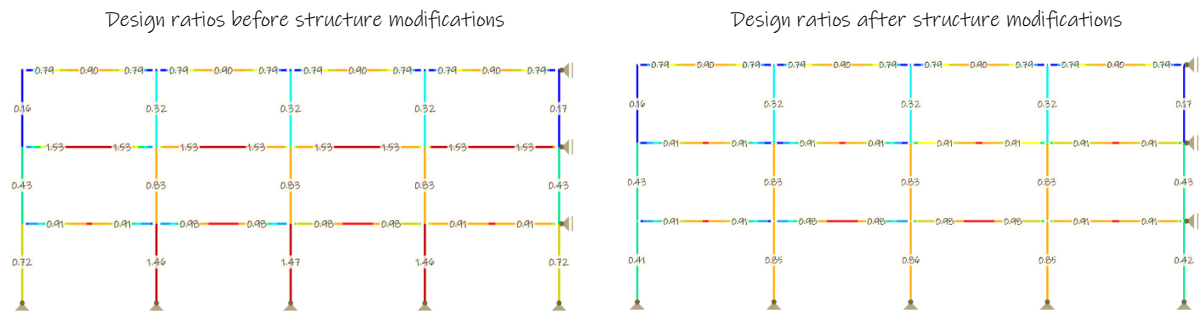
Design ratios of extended structure before and after strengthening and replacement measures.
